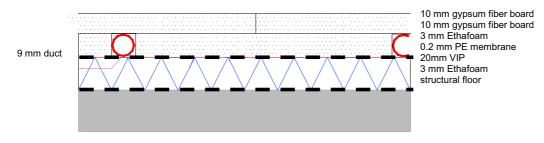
Principle construction layout of dry VIP based floor heating system (concept 2)
